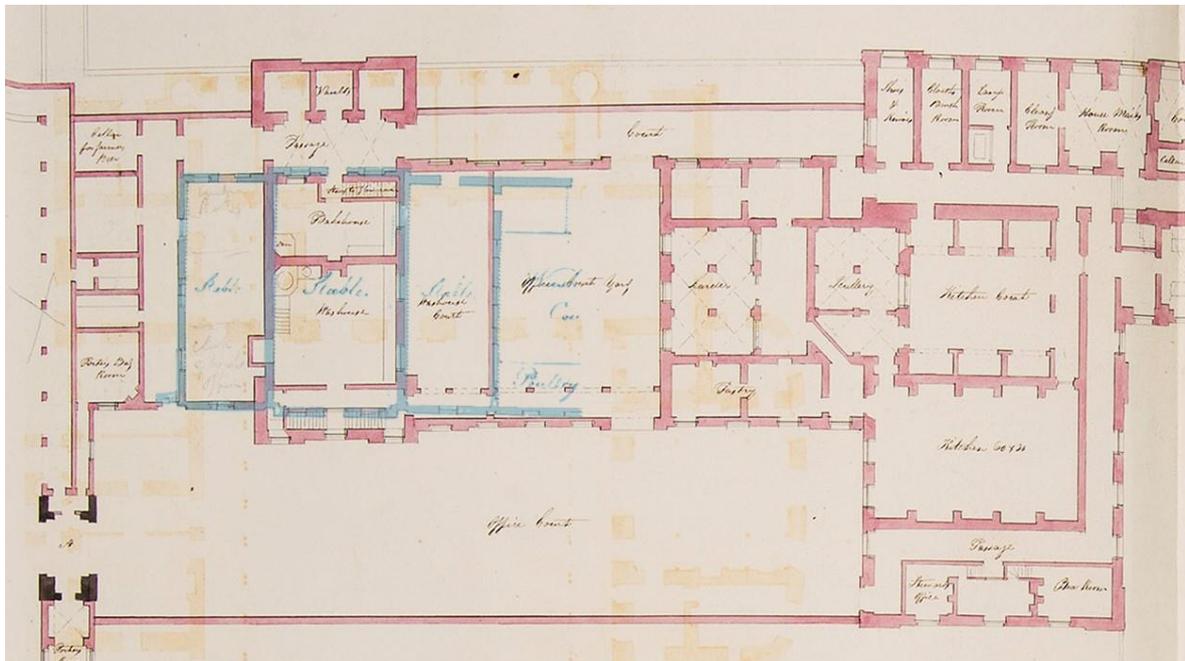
The basement-level floor plan of Paine's stable pavilion (in blue) superimposed onto the basement-level floor plan of Wyattville's north wing, showing the latter to be based on the footprint of the former.
